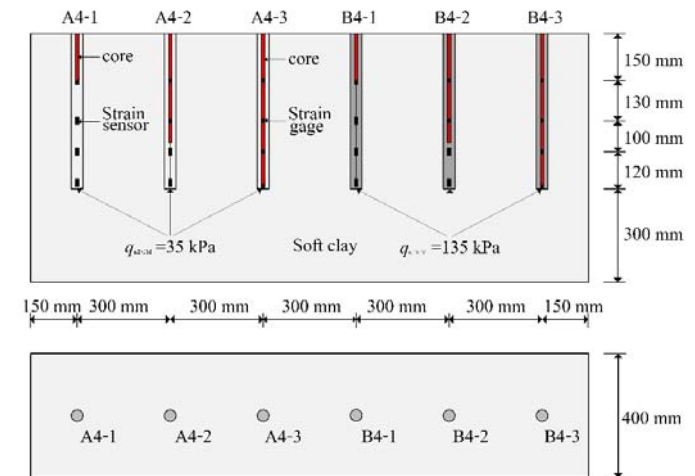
Installation layout of SDCM piles in the scaled down model tests
